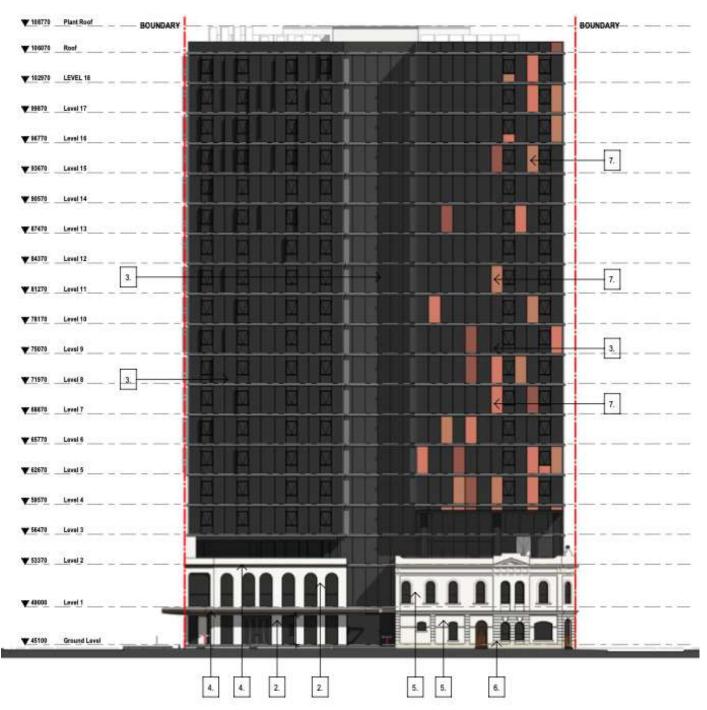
Extract from Brown Falconer drawings showing Grenfell Street elevation.
